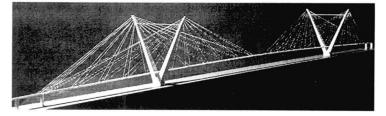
Architectural model of a cable-stayed bridge having a spatial cable system.
